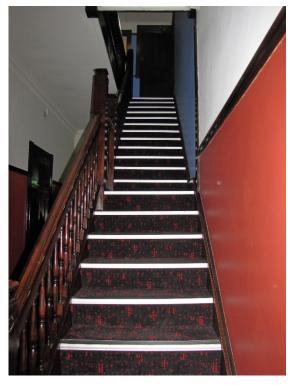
Internal stair connecting first and second floors — guest accommodation levels.
